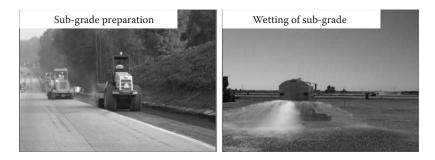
RCC subgrade preparation. (From Thompson, R R, *Roller Compacted Concrete Pavement: Design and Construction*, Columbus, OH, PCA and Kentucky Cement and Concrete Industry, 2002; Poole, B, Roller compacted concrete GDOT applications. In *Roller Compacted Concrete: Design and Construction*, Atlanta, GA, The Southeast Cement Association and PCA, 2008.)
